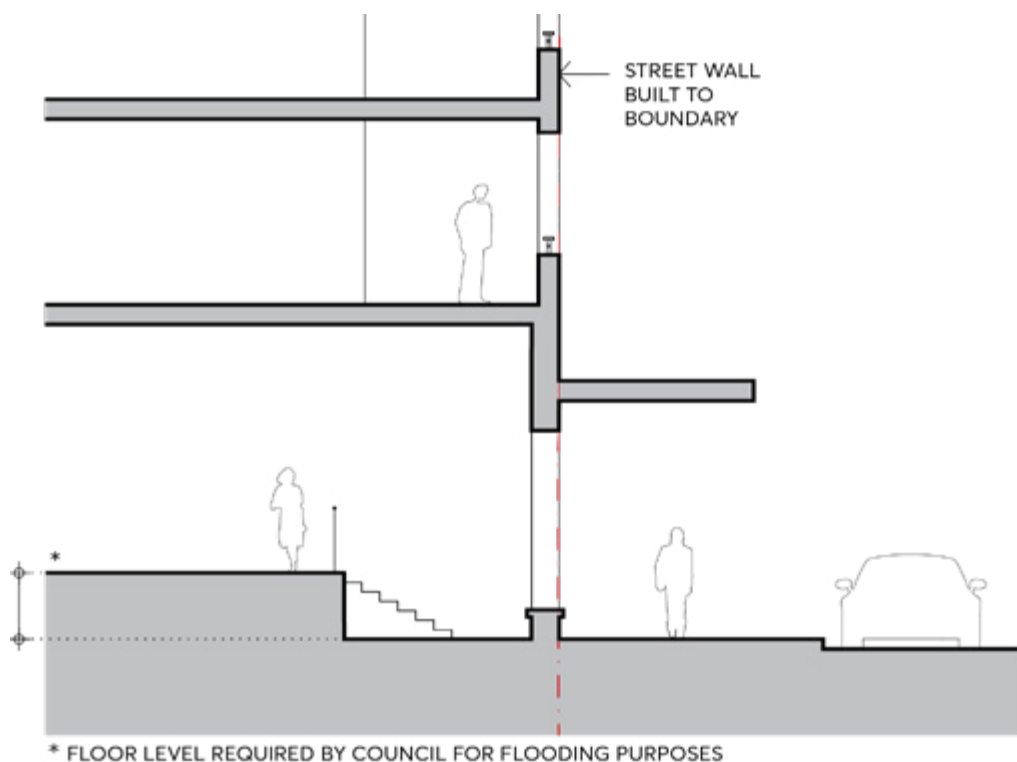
Active Ground Floor: Floor level permitted partly at footpath level
